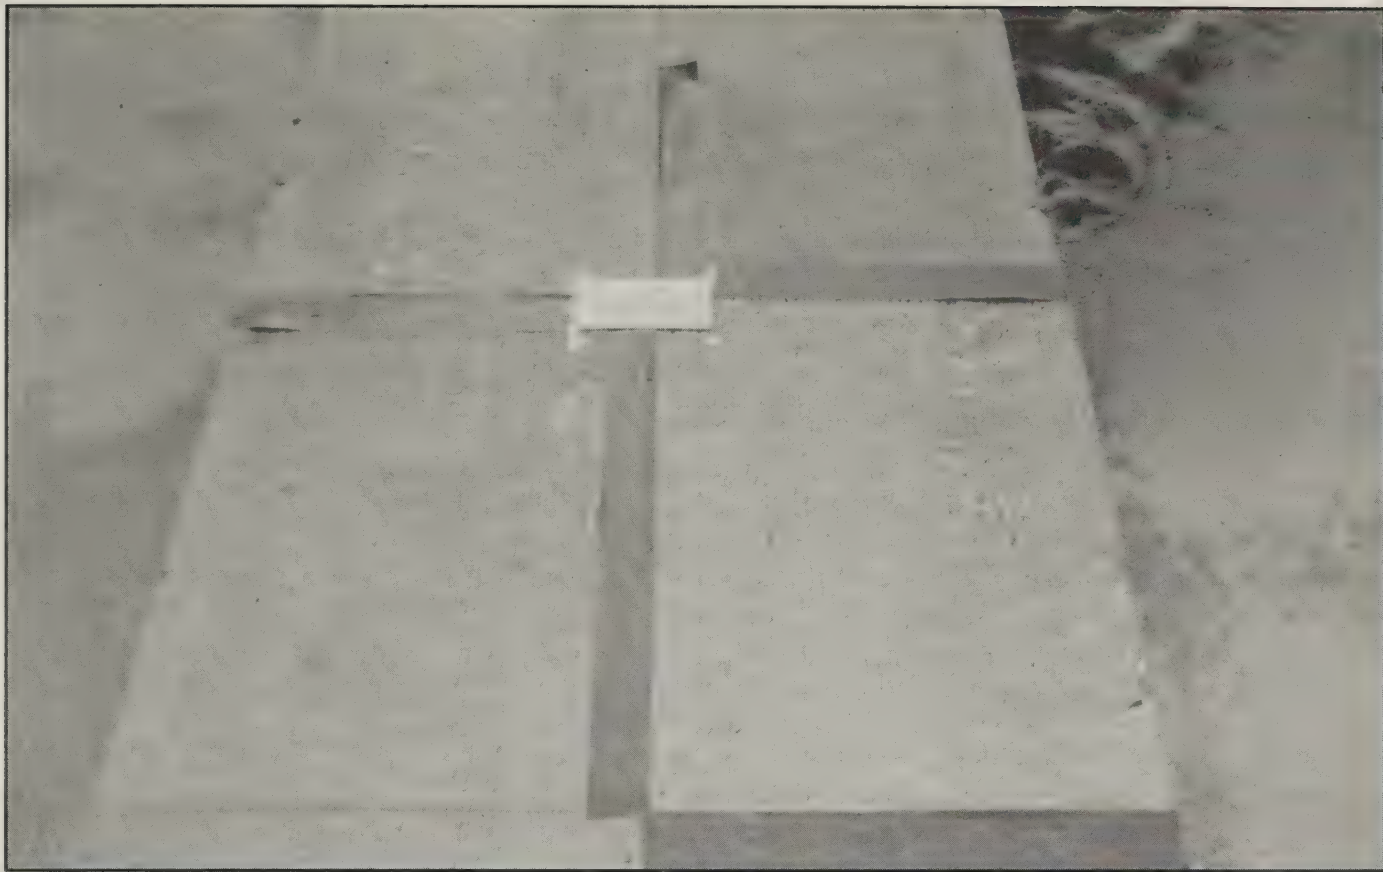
Subdivided concrete deck sections prior to sealer application.
